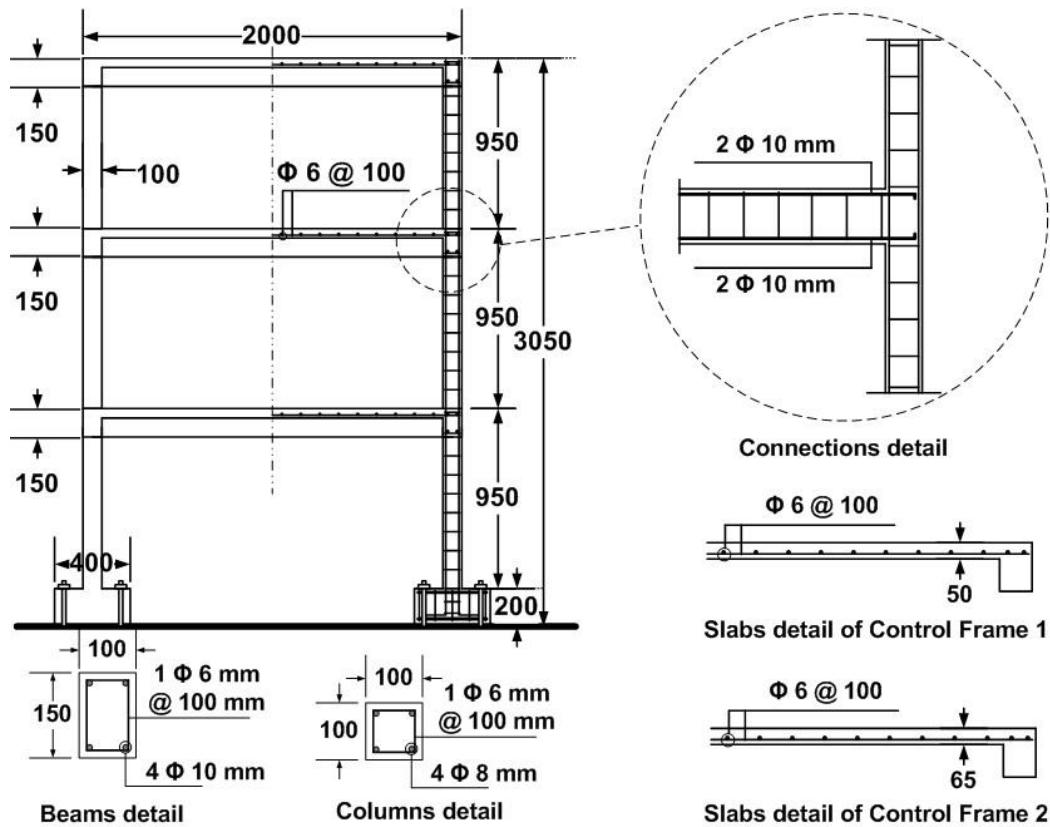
Schematic drawings of Control Frame 1 and 2. All dimensions in millimeters.
